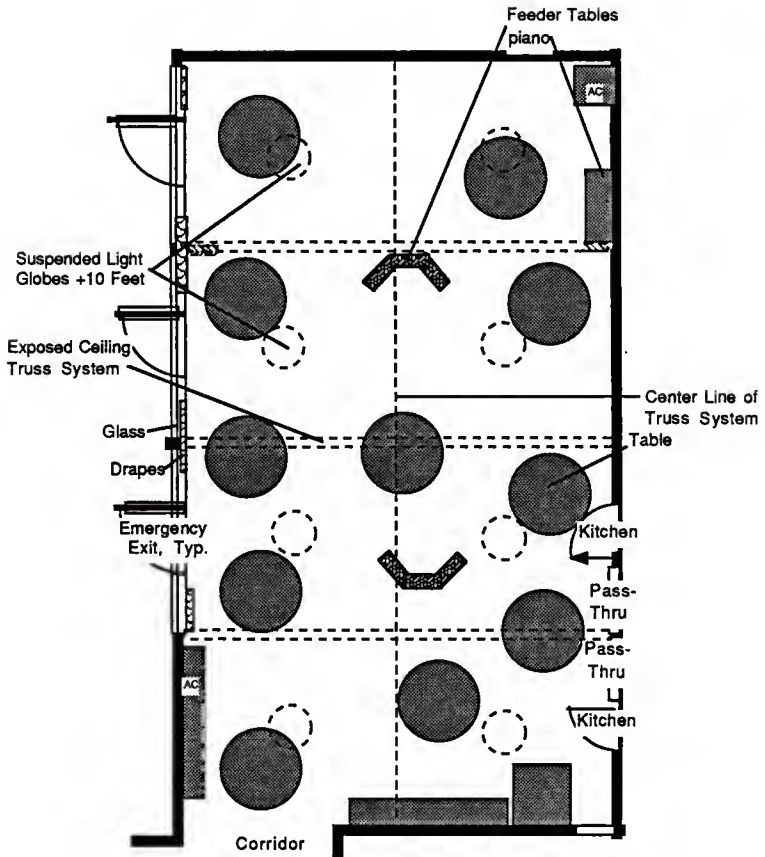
The Dining Room Plan. (Scale:  $1/8 = 1' 0''$  North  $\Delta$ ).
